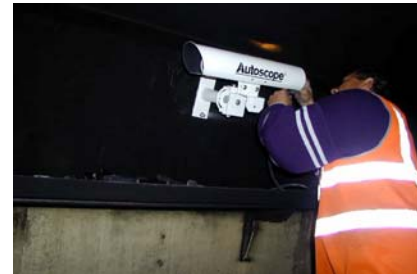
Autoscope Solo Pro mounted high on tunnel wall
